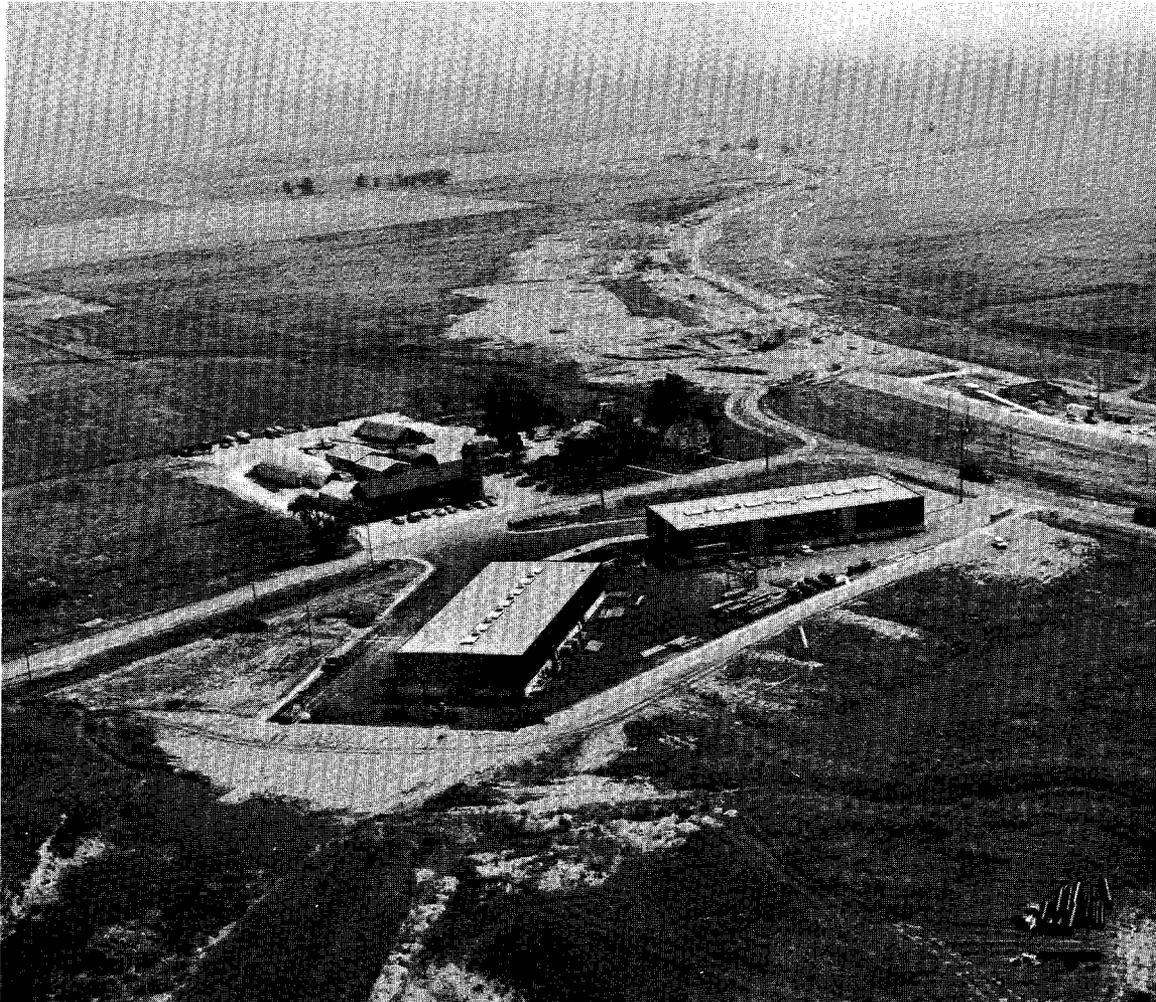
The Industrial Area from the air, looking southeast. The old air building has been moved from the Village and is across Feldott Road, being used as a stores building. We are now planning on building another Industrial Building south of the present location of the air building.
